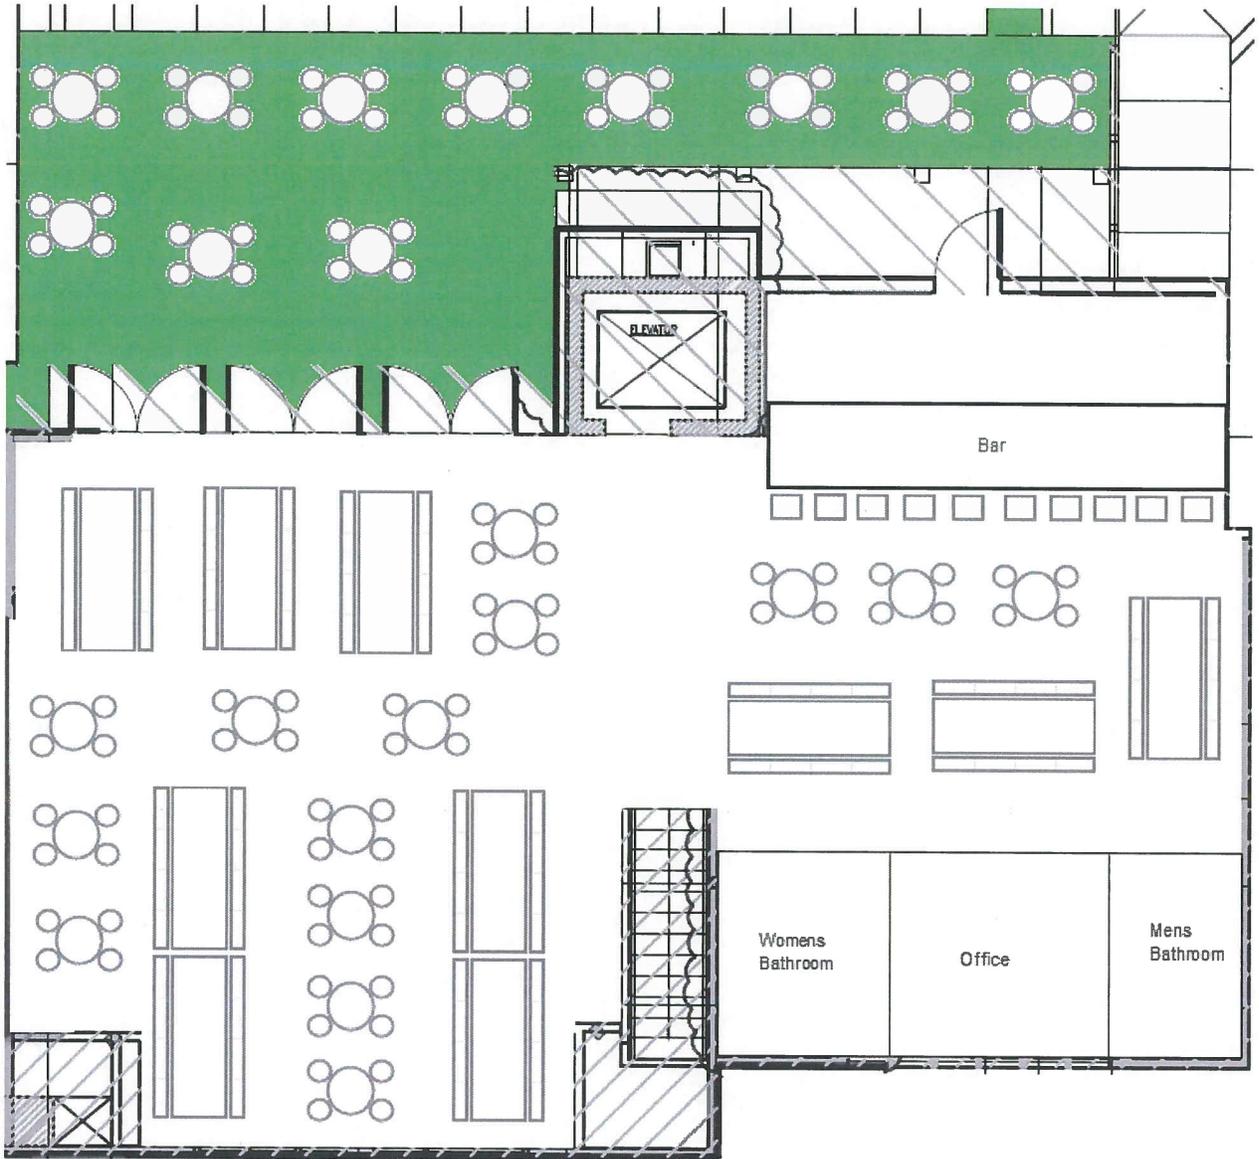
Second Floor Tap Room/Event Space with highlighted Seasonal Seating
